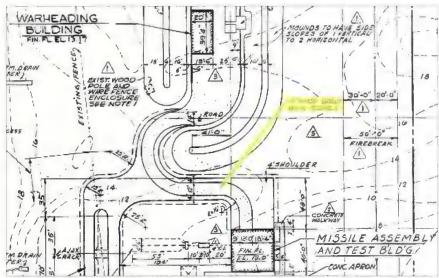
Detail of missile dolly walk, Missile Assembly and Test Building and Missile Maintenance Area, Site Plan; Paving and Sewage Disposal, 1958. To accommodate the larger Hercules missiles, a concrete walk was widened from six to twelve feet (highlighted in yellow). The walk was designed for use by a dolly that would transport missiles from the Testing and Assembly Building to the Warheading Building (GATE 7620-2983).
